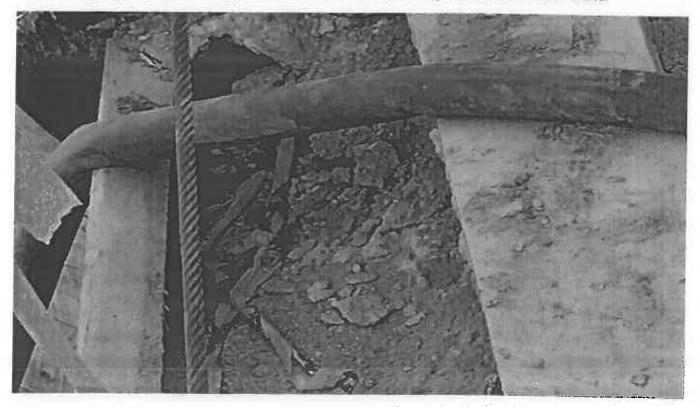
Ongoing pumping of muddy groundwater from foundation footing into active stormdrain onsite.
